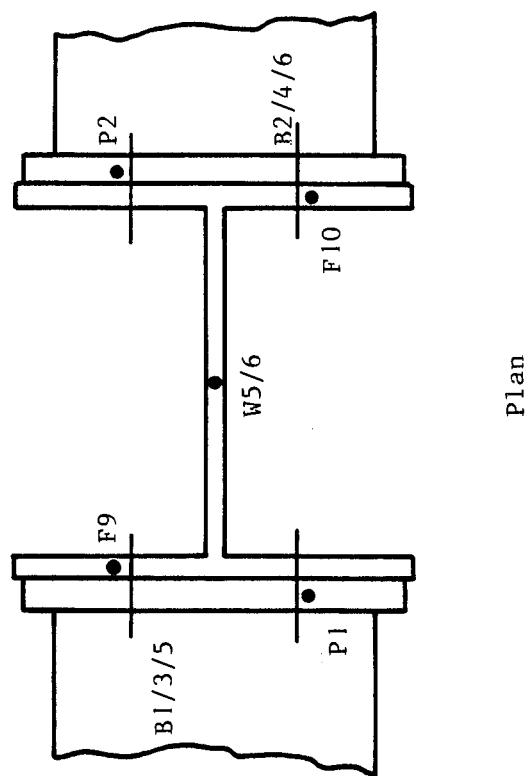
THERMOCOUPLE POSITIONS - ASSEMBLY NO. 1
